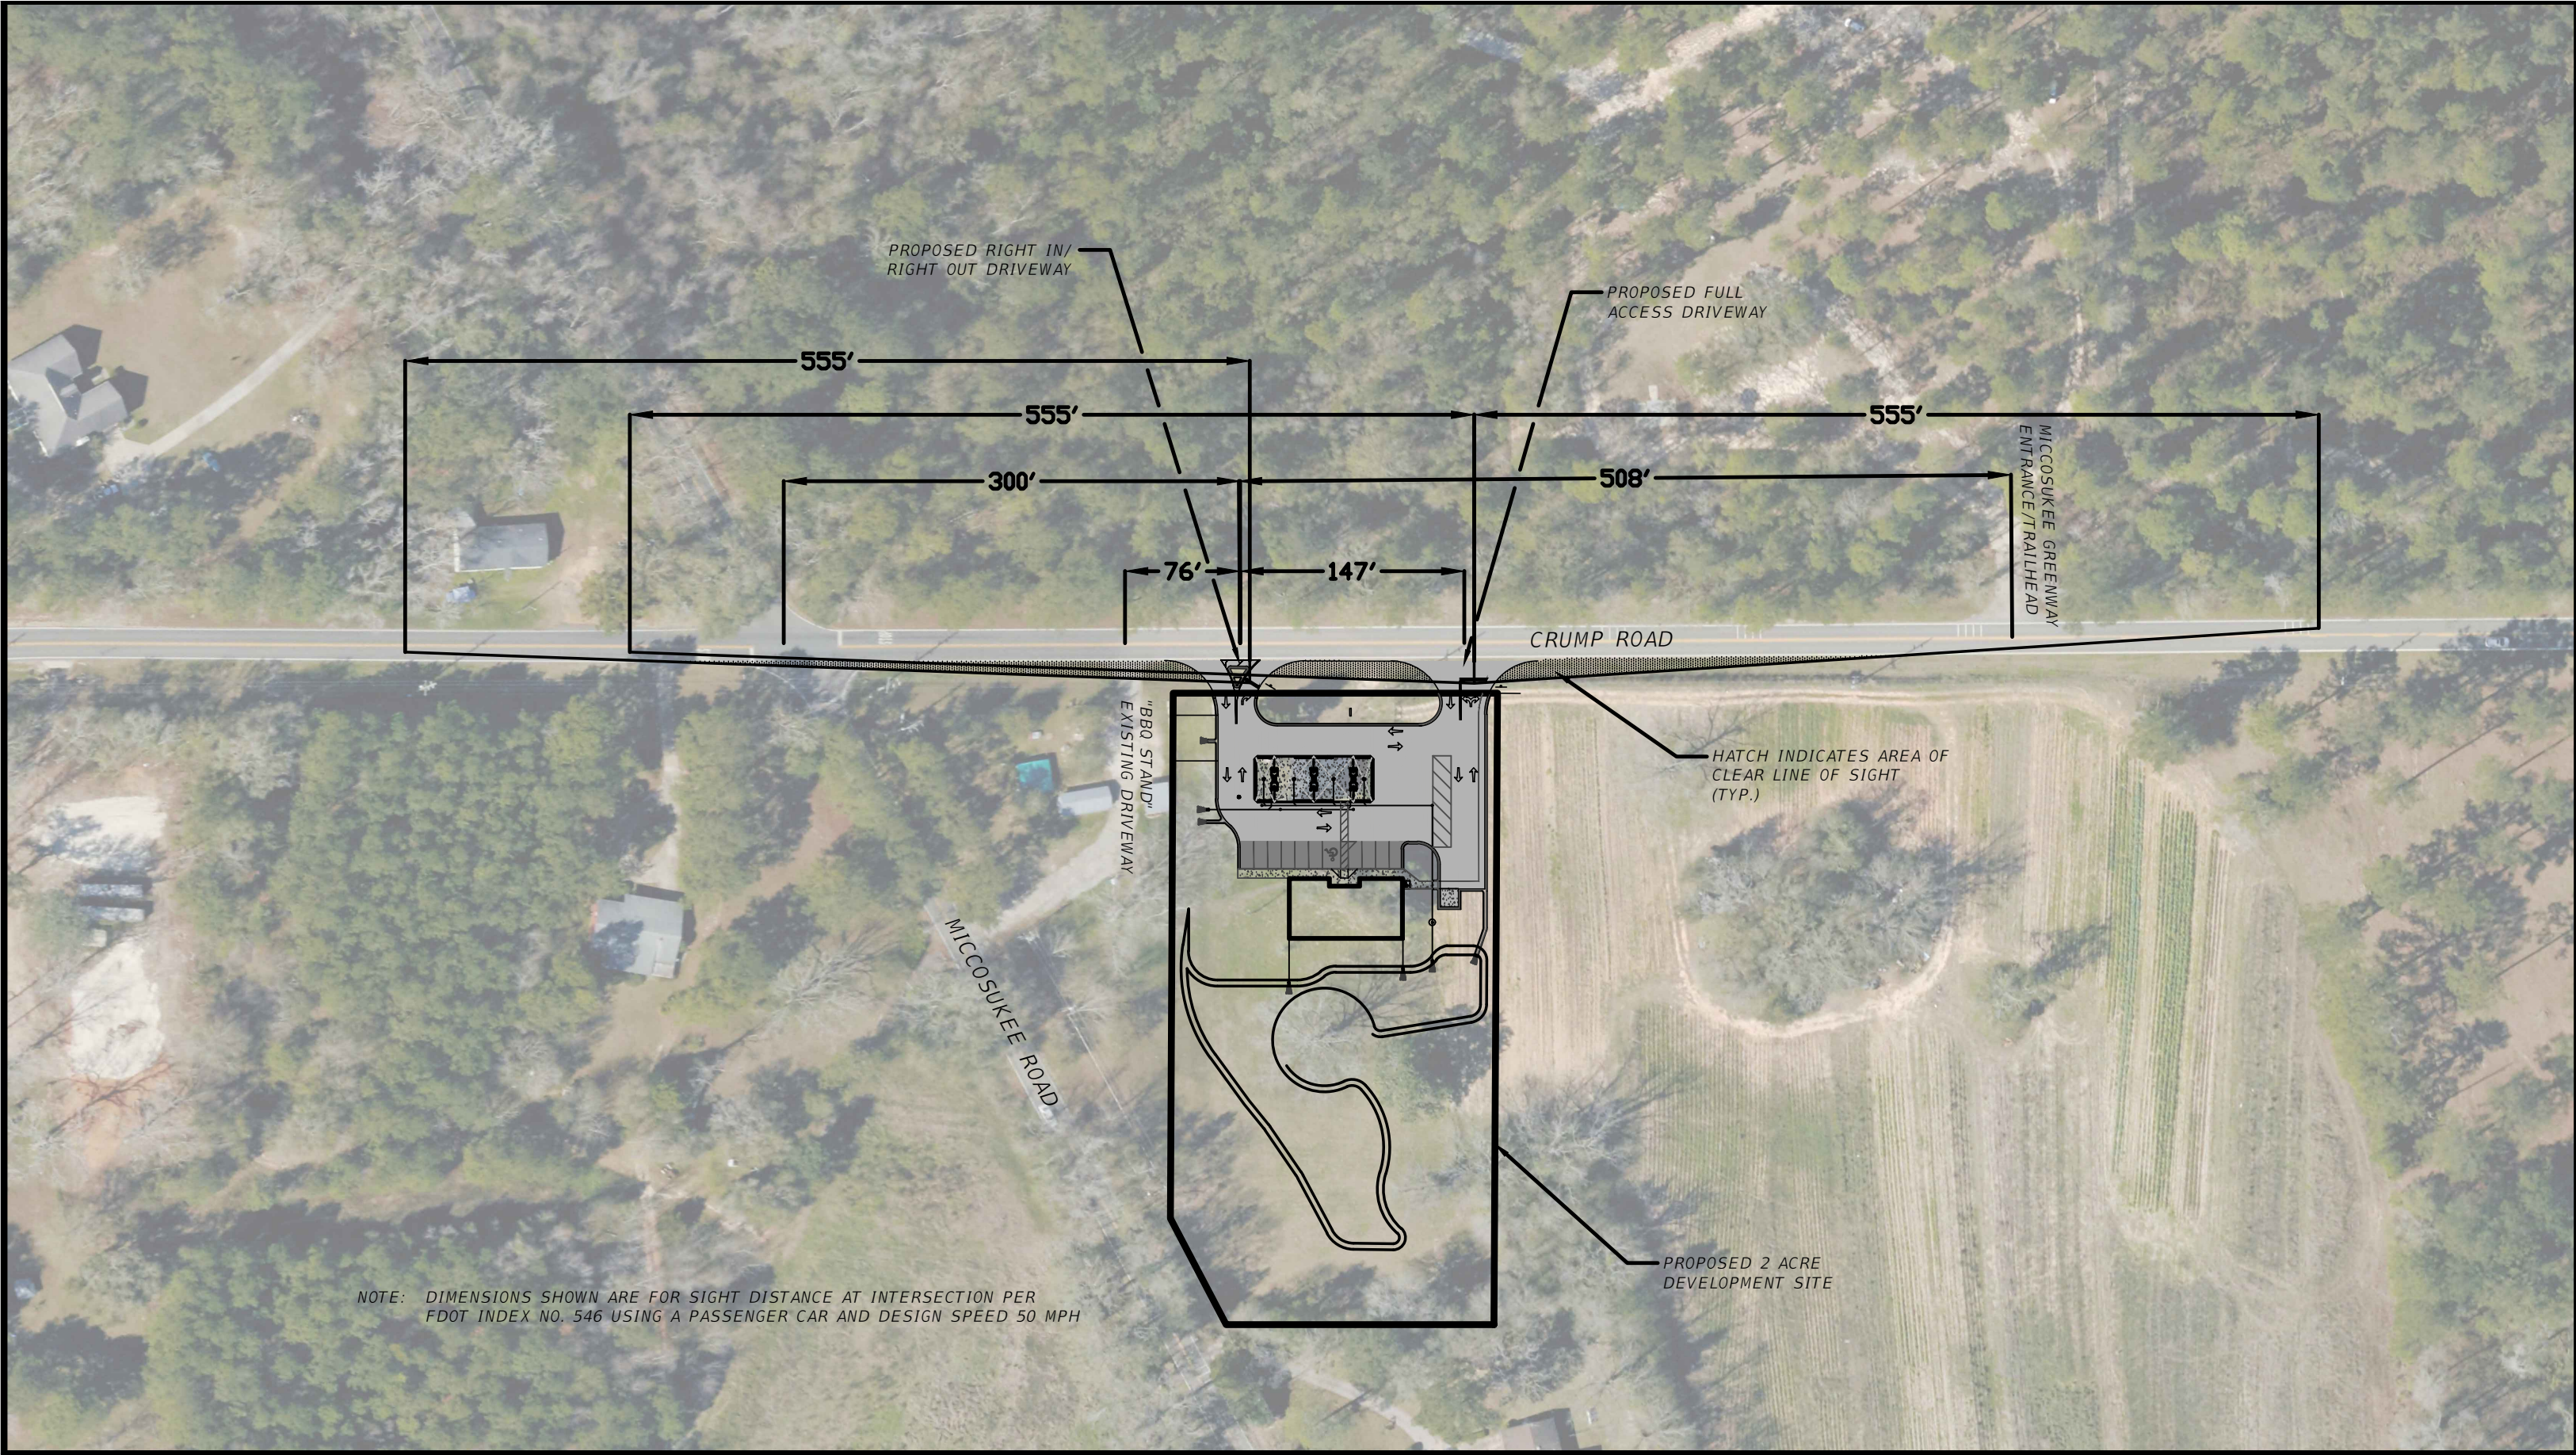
EXHIBIT B – SIGHT DISTANCE/DRIVEWAYS WITHIN 300'
